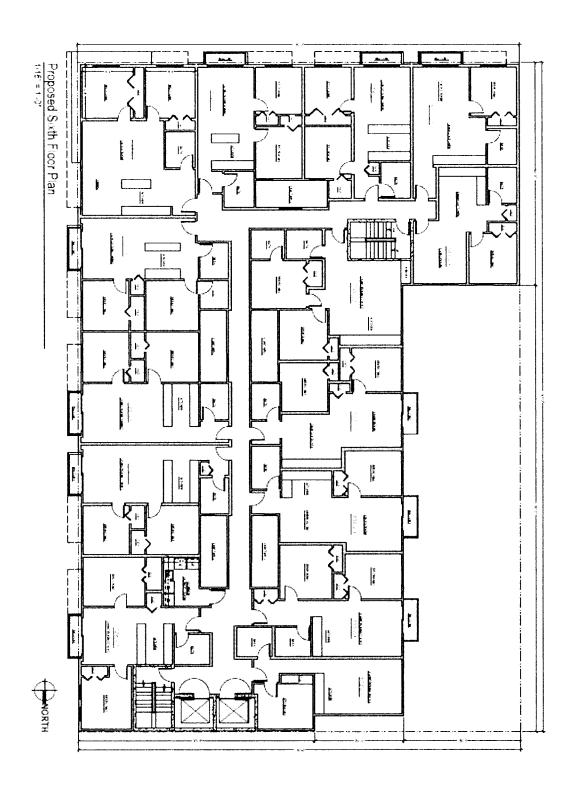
Sixth Floor Plan 480 Potrero Avenue Source: Sia Consulting, August 2012
